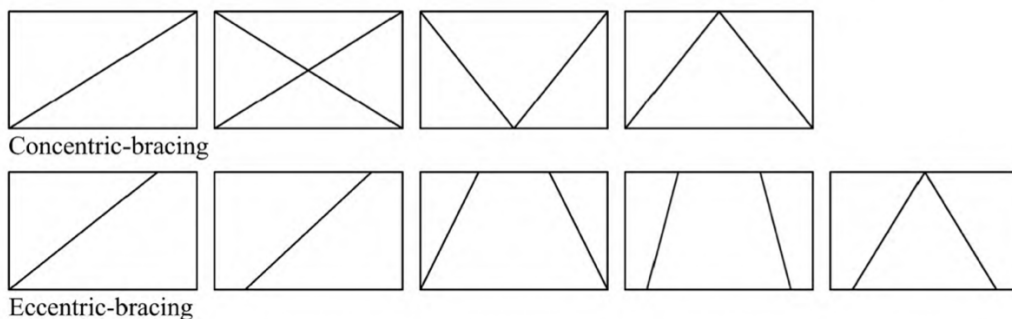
Types of Concentric Braced Frames and Eccentric Braced Frames
